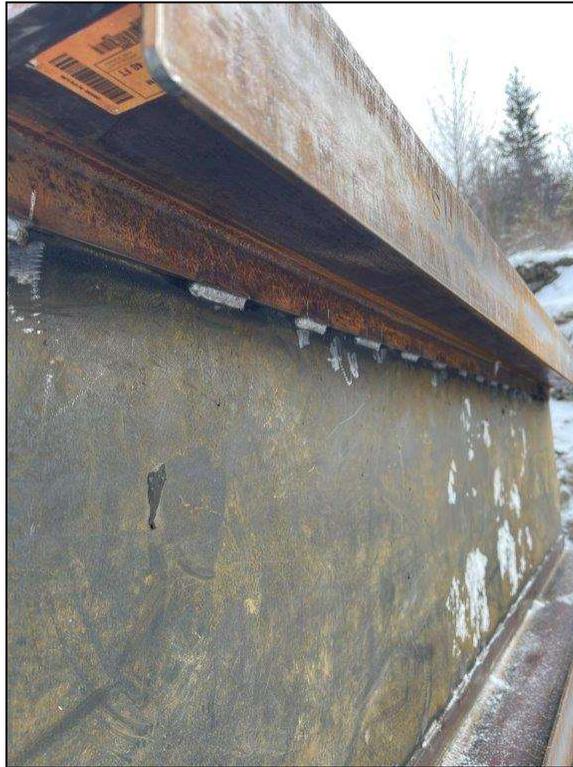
New Dead Man Wall Reinforced Plate Bottom Stitch Welds (Typical)
